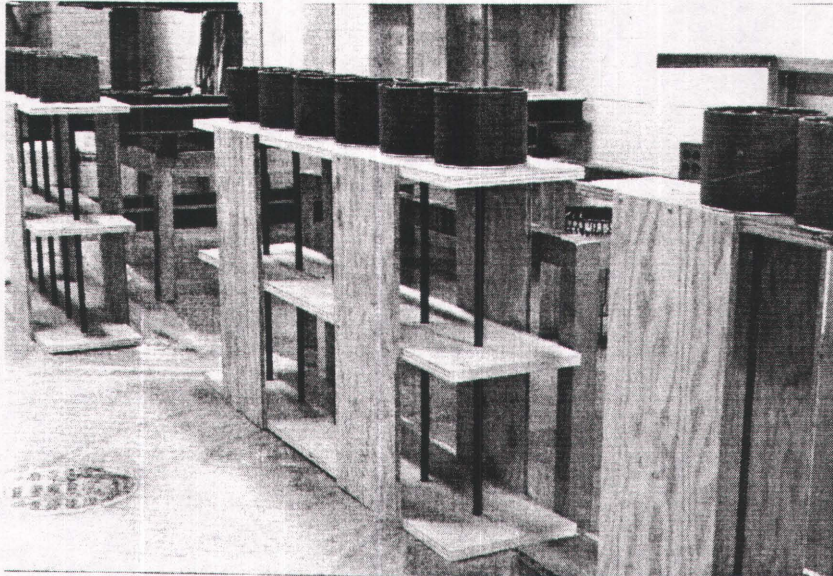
Set-up (with added middle plywood plate) for pouring concrete in anchor end cylinders.
